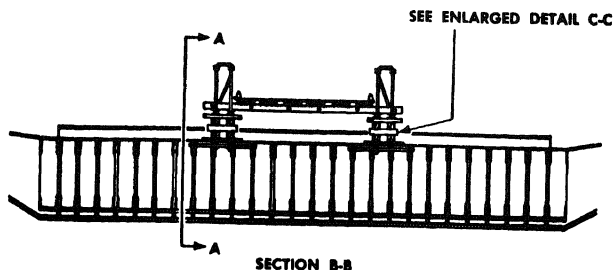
Adapting barges for gunwale loading. Section B-B.
